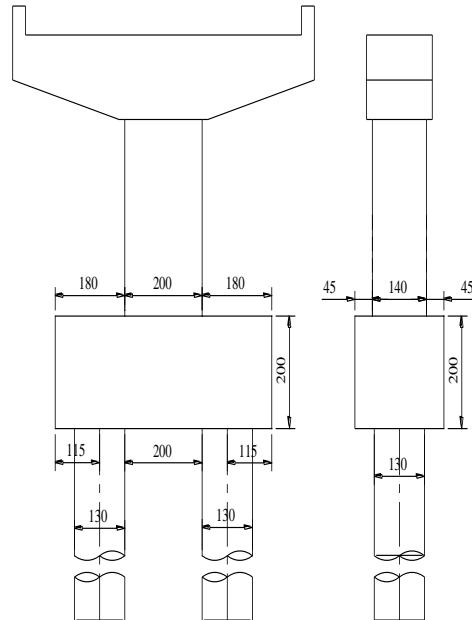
Structure of 5# pile of ramp bridge (unit: cm)
